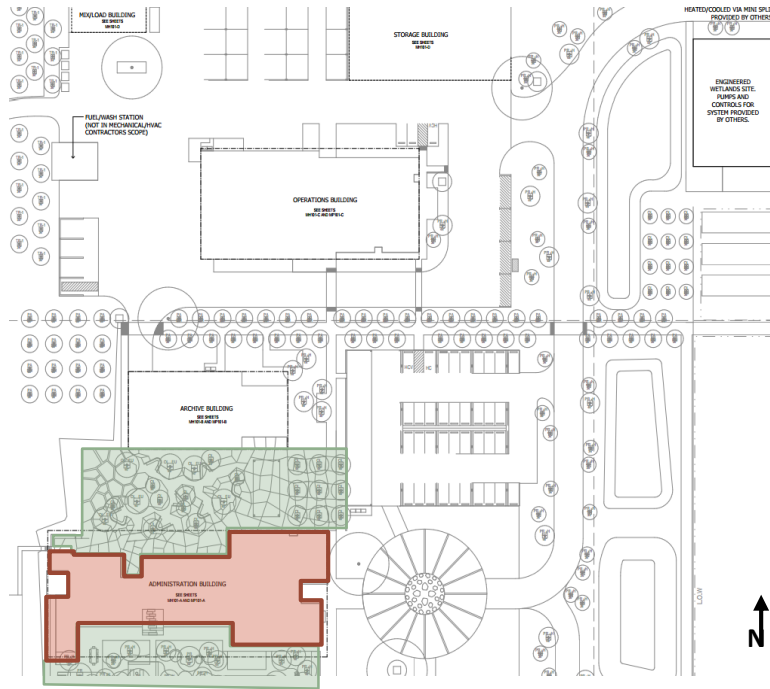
SITE PLAN COURTESY OF HGA ARCHITECTS AND ENGINEERS
